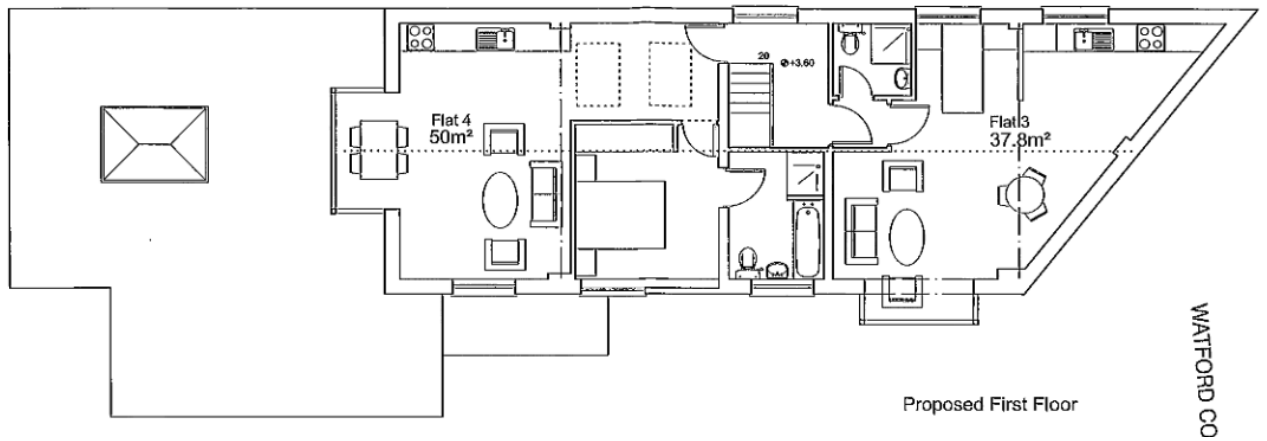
Refused proposed first floor plan for planning application 15/01385/FUL.
